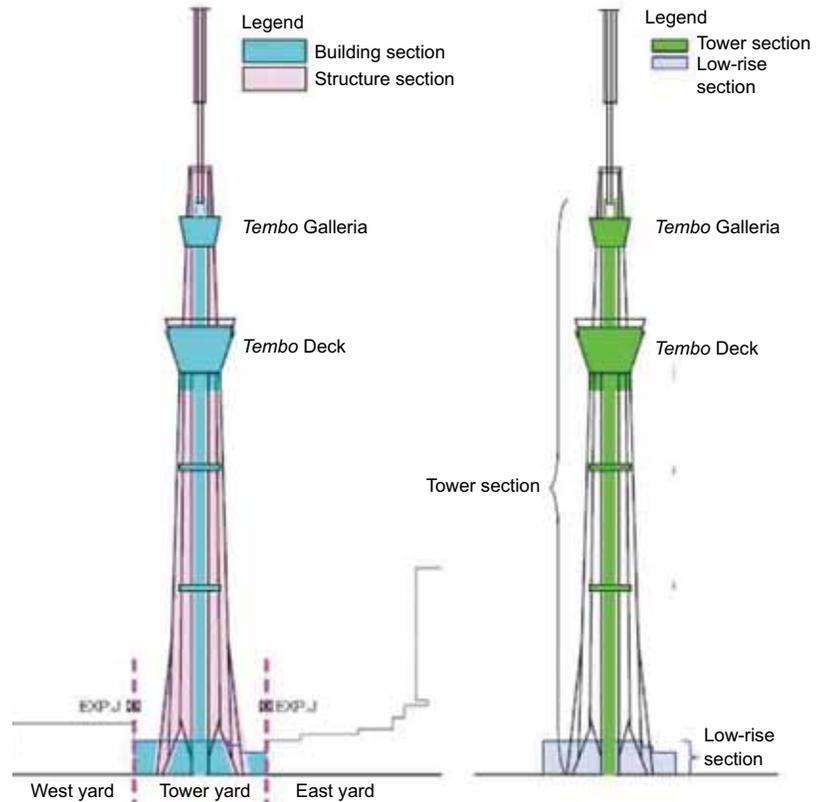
Distinction between Tokyo Sky Tree's building and structure sections, as well as its low-rise and tower sections.
